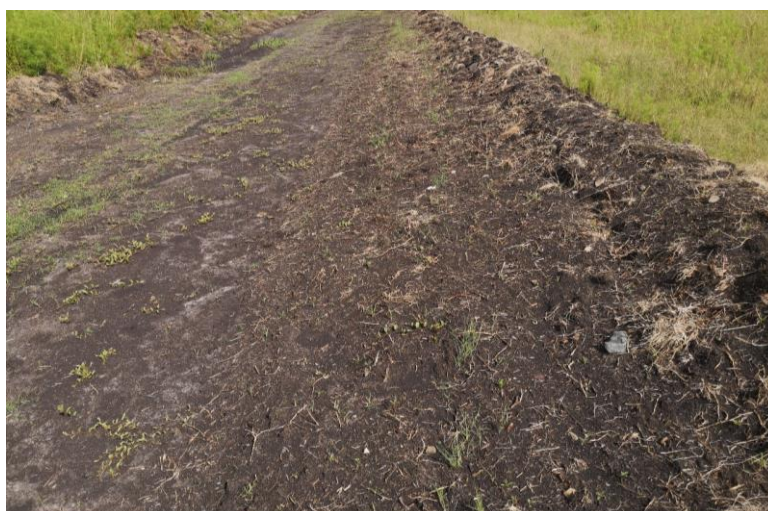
Project area existing soil (photo taken at the site visit on 21st to 23rd March)
